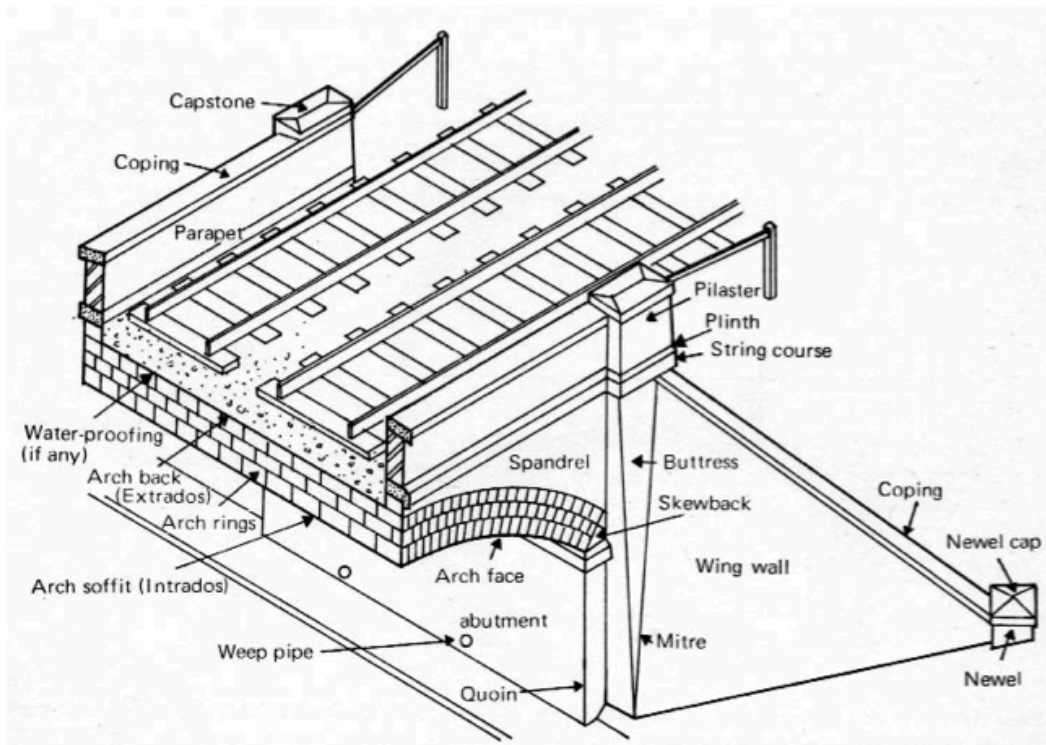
The main element of a masonry arch railway bridge ,
